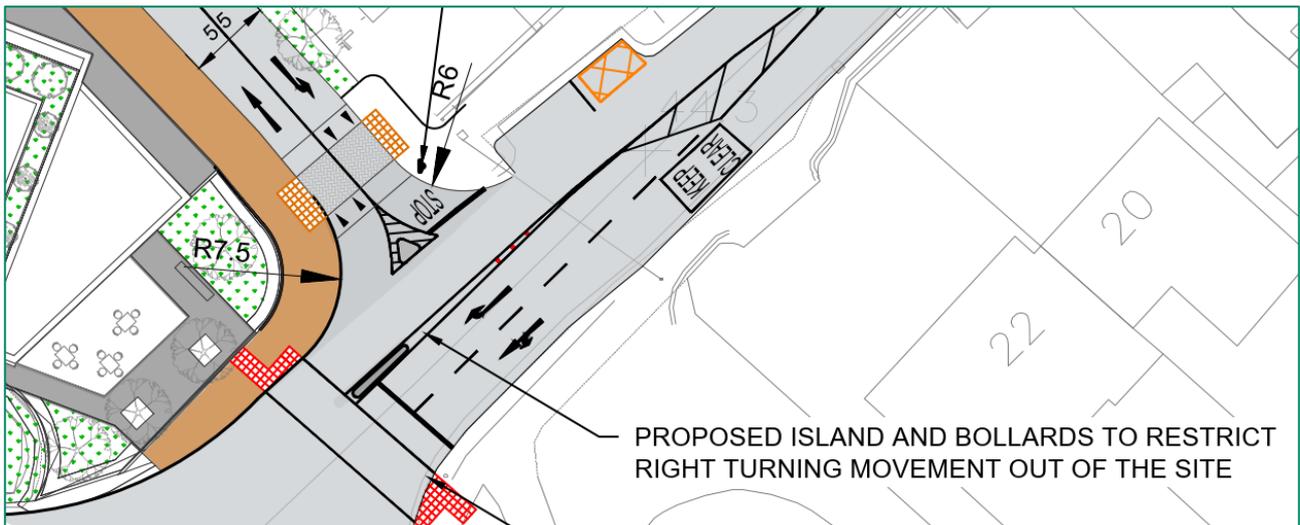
Permitted Site Access (ABP-307092-20)
